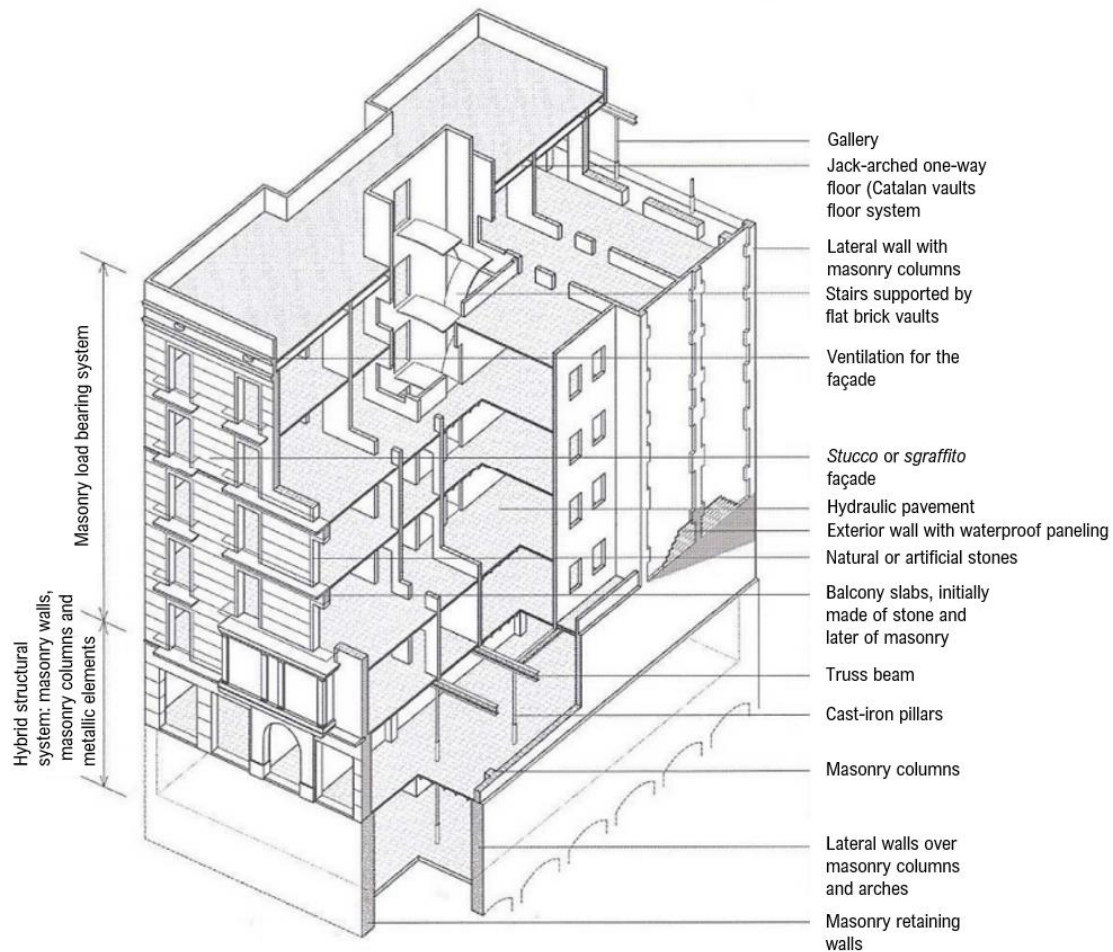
Section of a typical existing *Eixample* building including all structural and non-structural elements (adapted from Paricio Casademunt 2001).
